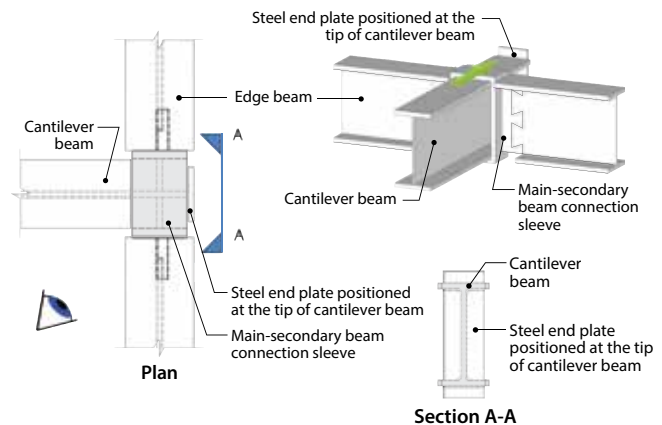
Connection between cantilever beam and secondary beams using dovetail mortise connecting plate.
